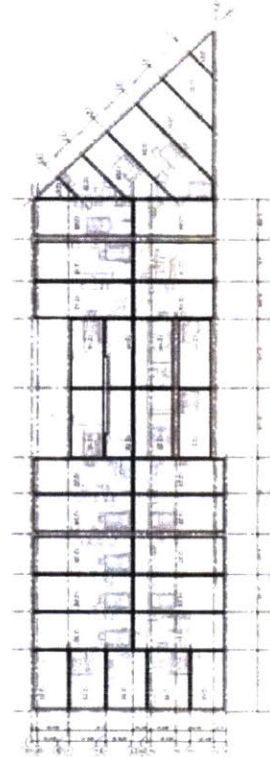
MODULE LAYOUT (FARNSWORTH 2014)
